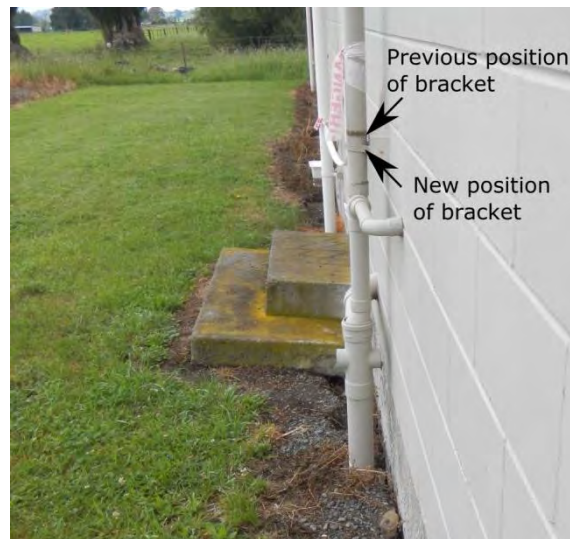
View of east wall of house on Schoolhouse Road (-9 Dec 2016, S42.3682, E173.6501, facing S).
